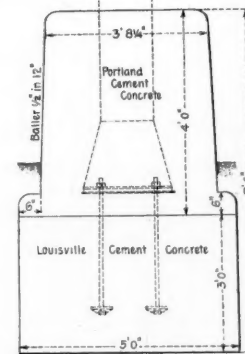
Base of Pier Section at Right Angle to Tracks
